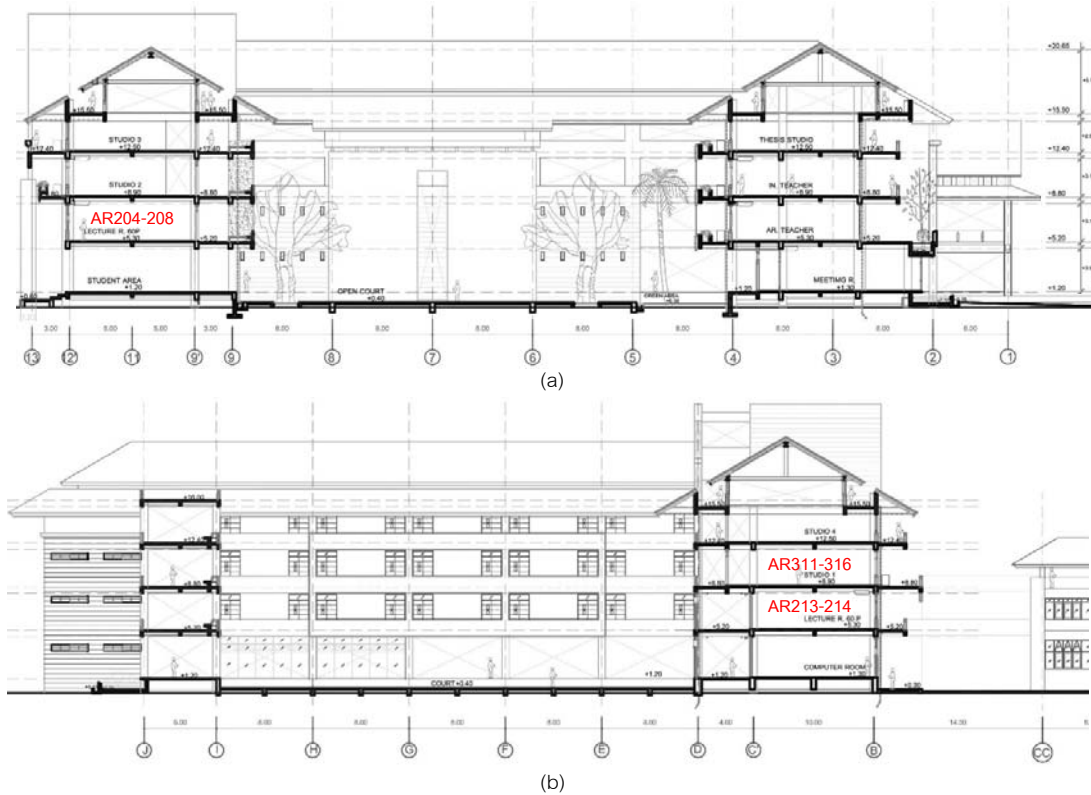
2 Building cross and longitudinal sections show the positions of all lecture rooms: AR204-208, AR213-214 and AR311-316 which located on the first and second floor. (a) Southwest to northeast section and (b) Southeast to northwest section. Source: As-built construction drawing of Faculty of Architecture, Urban Design and Creative Arts, Mahasarakham University.
